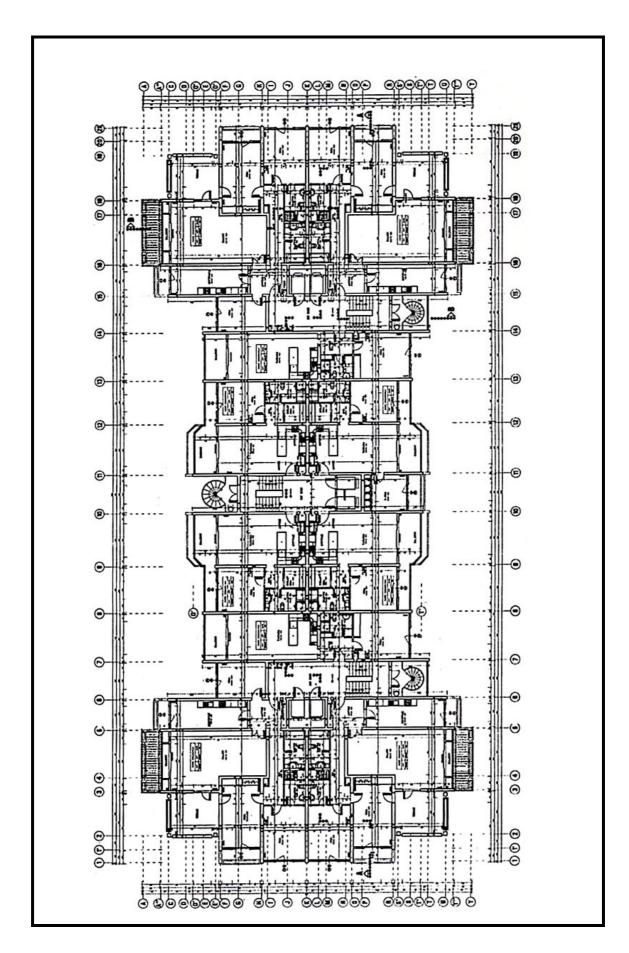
Mavişehir II; Kuğu 14th-Floor Plan
